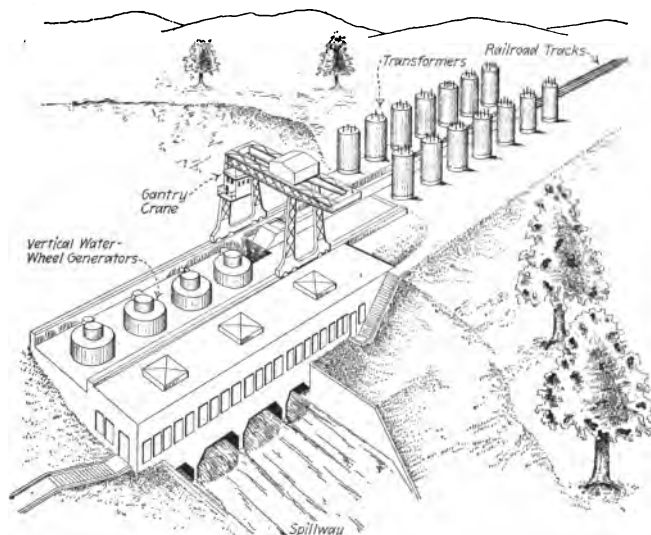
Showing general arrangement of the proposed outdoor hydro-electric station.
